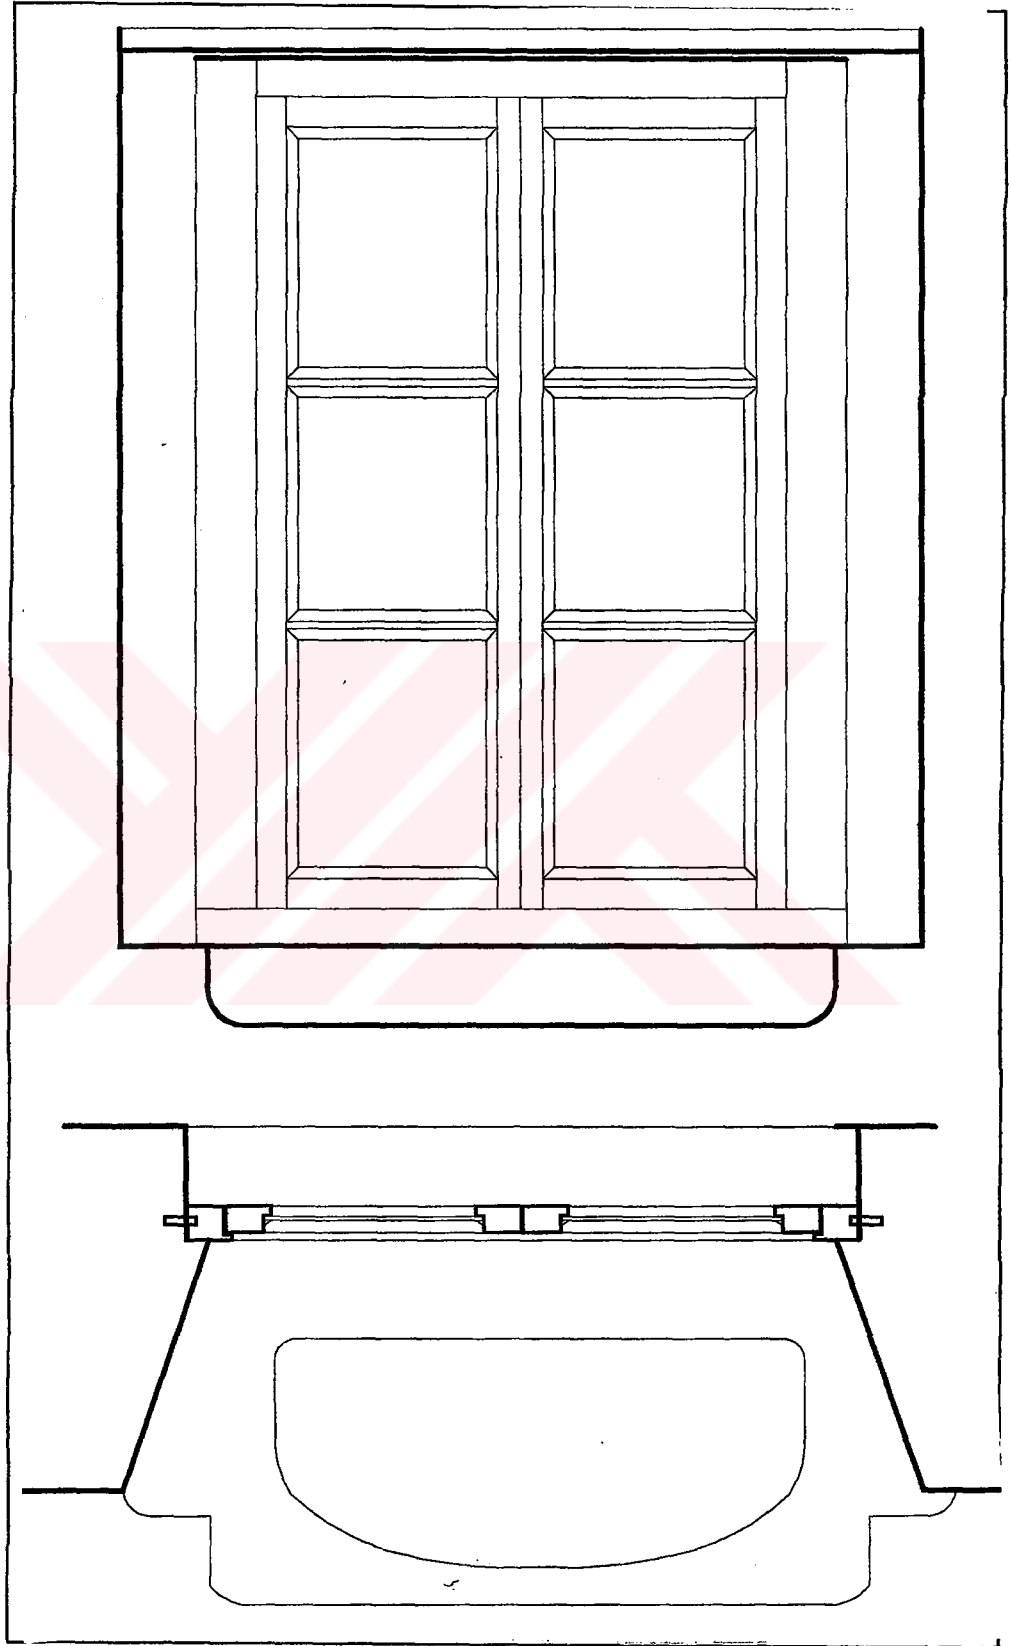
W02A-İzmir Caddesi No:96 Elevation and Plan of Kitchen Window
